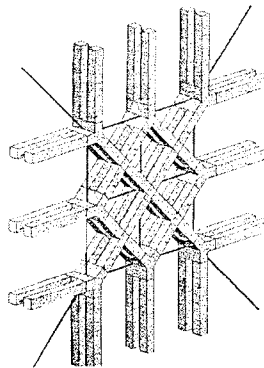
Typical module cast in cement concrete to help with faster and economically viable construction.
